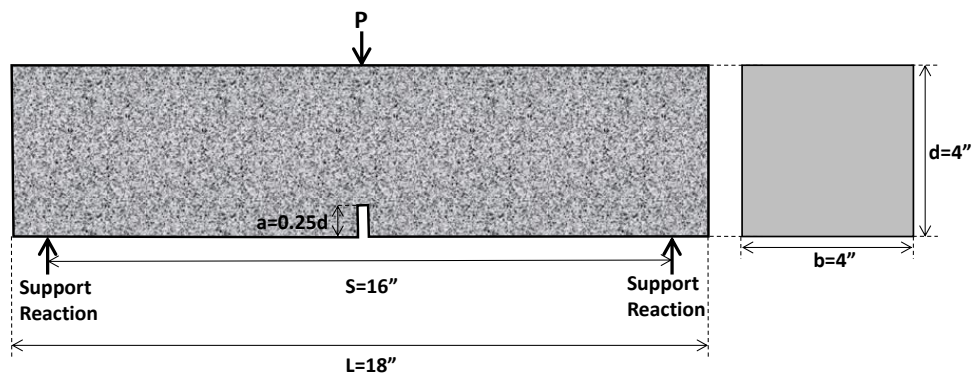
Schematic side view of the 3PB test setup and the beam dimension
